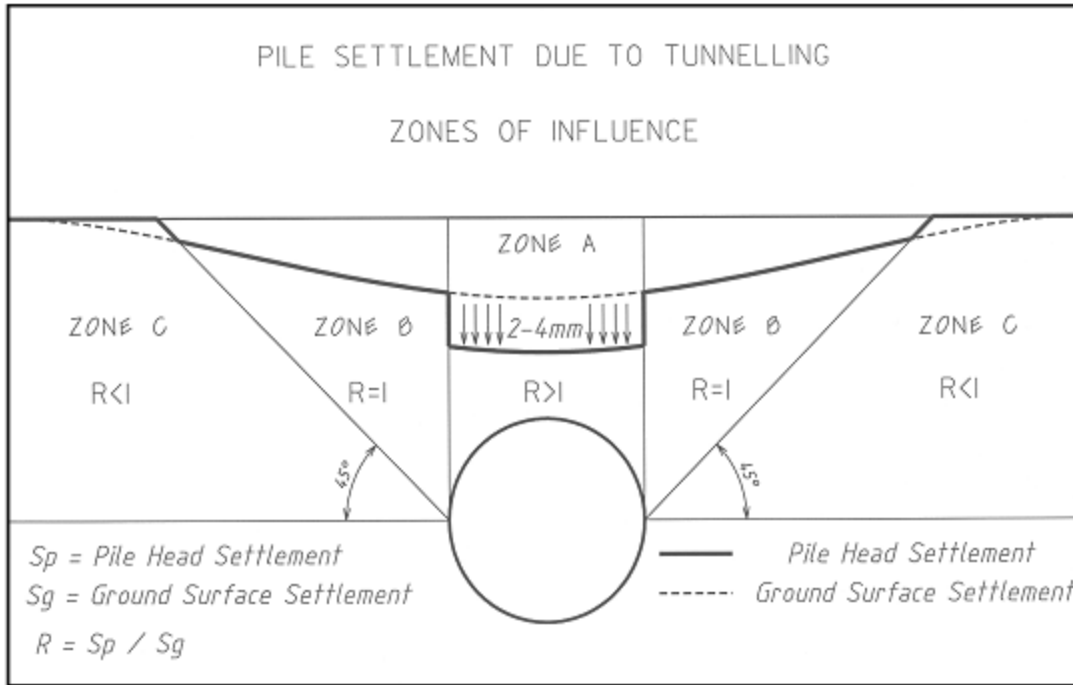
Zones of influence between tunnel and pile toes positions of new Channel Tunnel Rail Link (CTRL) full-scale excavation proposed by Selemetas et al., 2006
